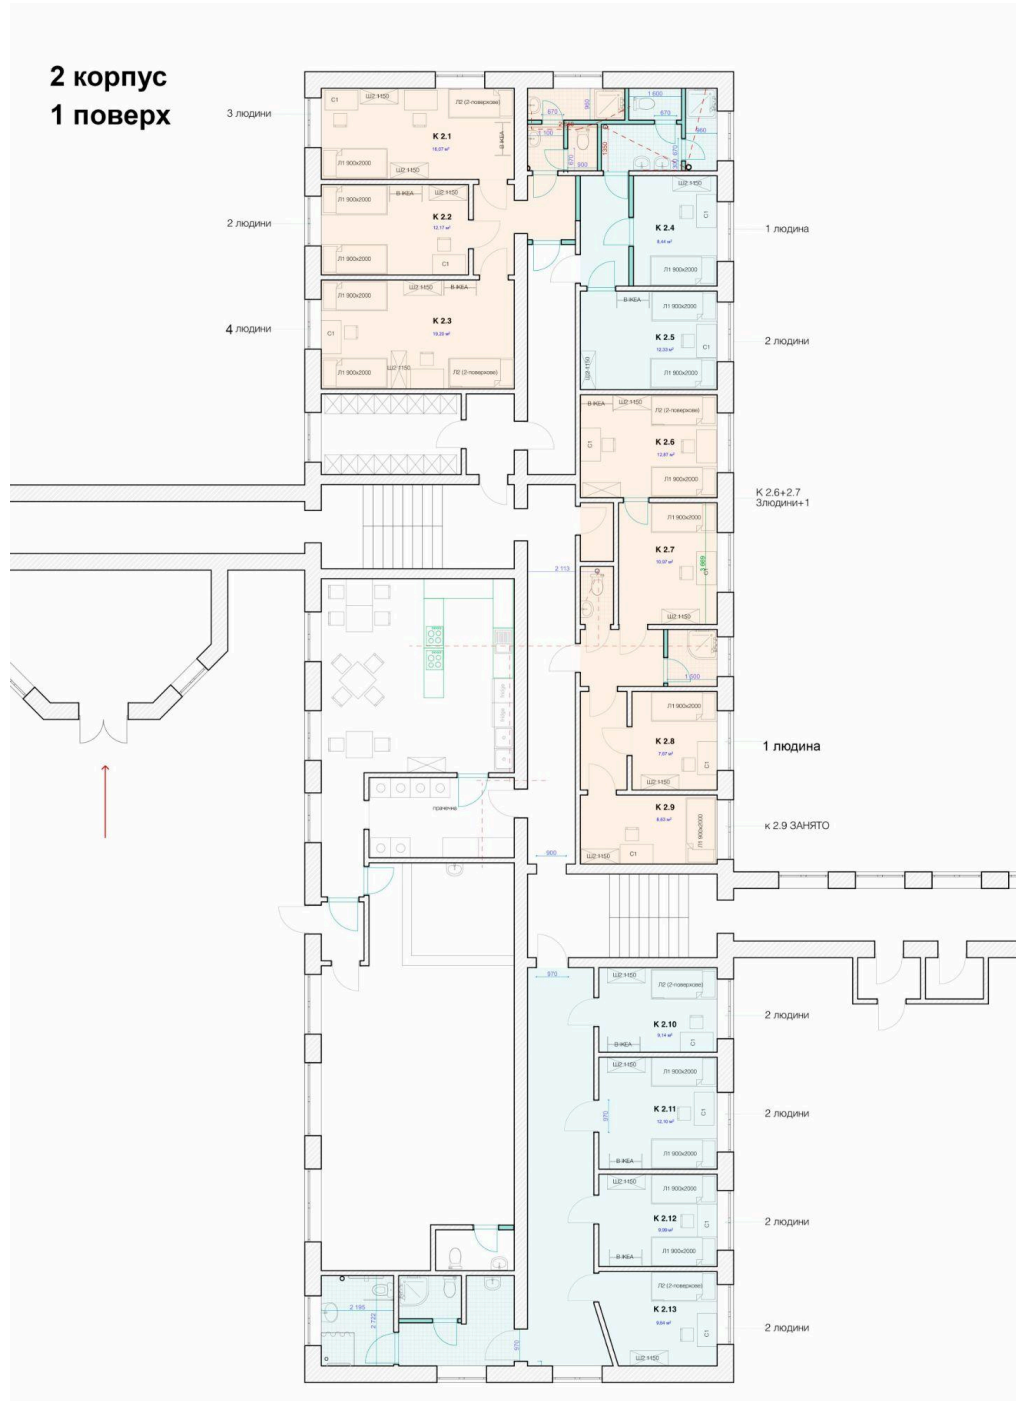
Sadok – Section 2, 1st Floor Plan
